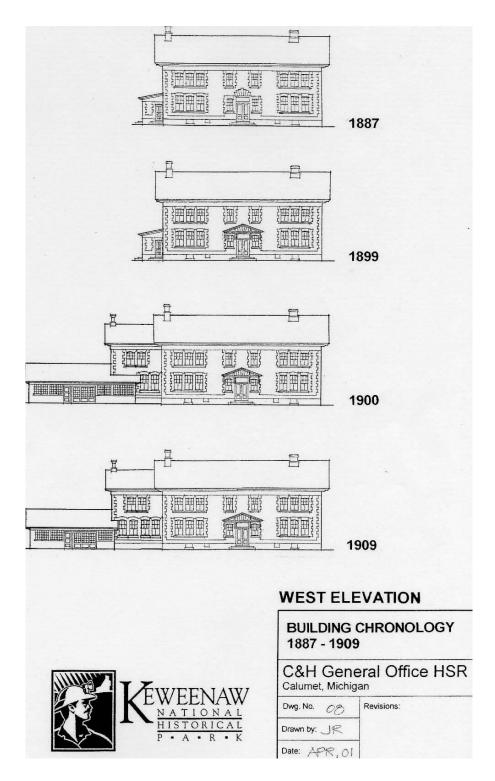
C&H office building chronology showing west elevation additions made from 1887-1909. Nicely shows changes made to the north elevation through time. Image courtesy of Keweenaw National Historical Park, Calumet & Hecla General Office Draft Historic Structure Report.
